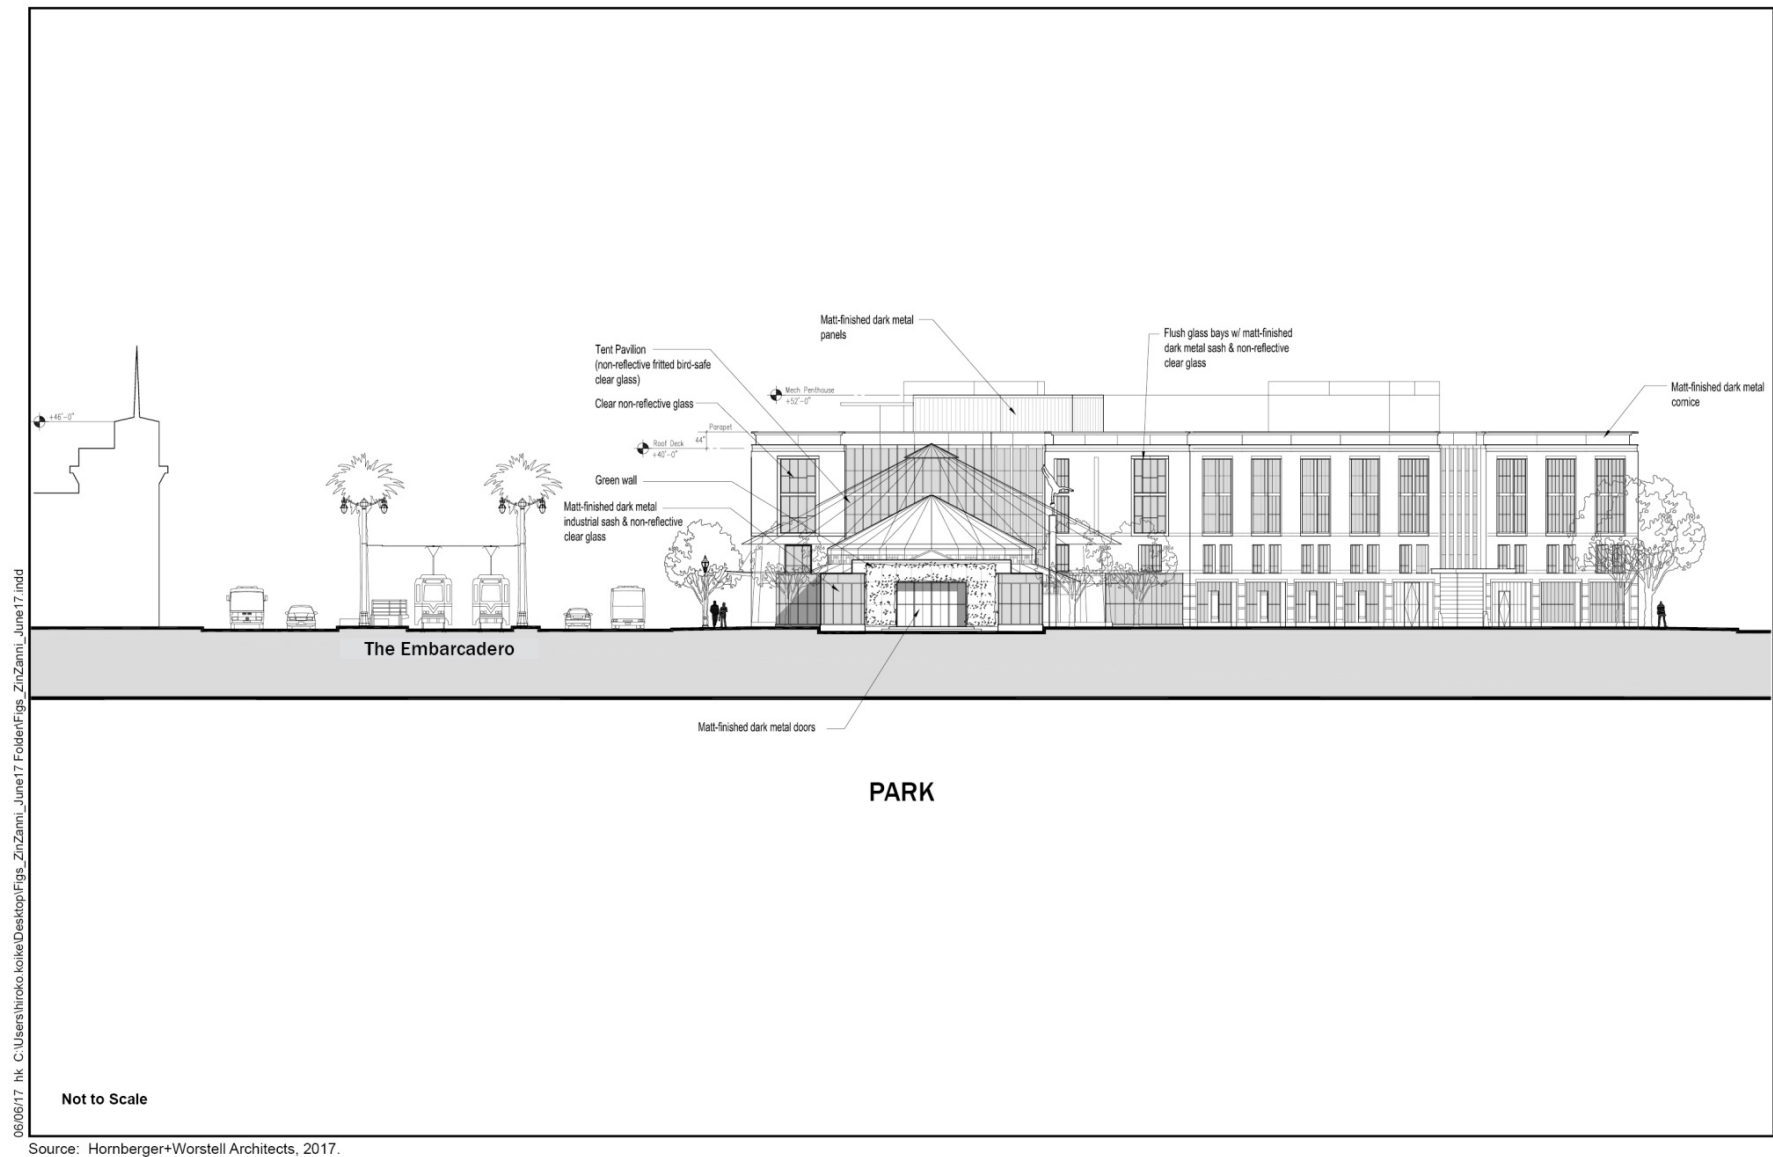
PROPOSED ELEVATION – SOUTH, PROPOSED PUBLIC PARK
